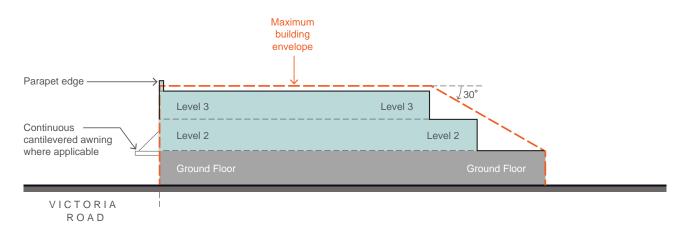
Victoria Road Drummoyne Area F - Maximum Building Envelope Section
